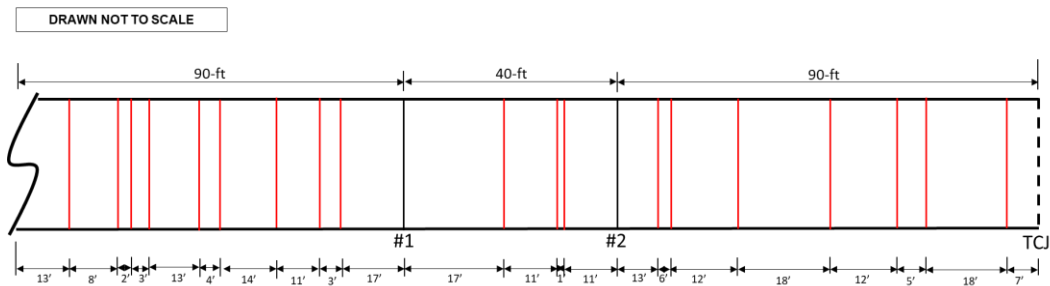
US62/180 El Paso test section crack map at 462 days from concrete placement
